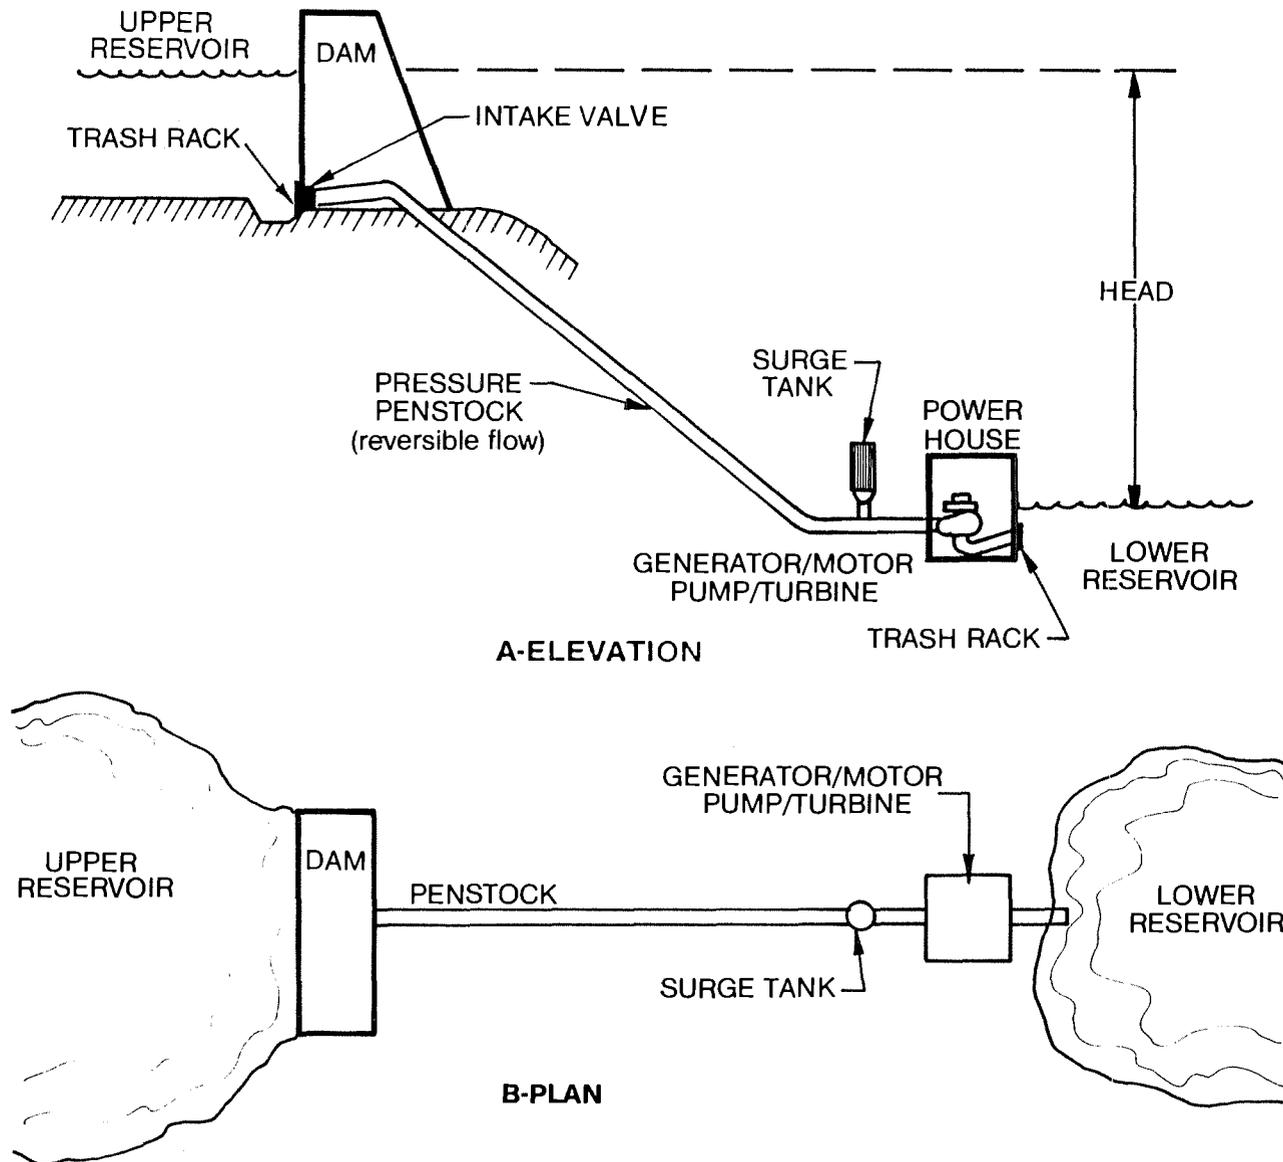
Schematic of a Pumped Storage Hydro Plant
